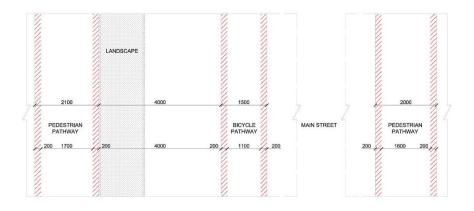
Street width and buffer spaces (in mm) for Gateway 10 in the area surrounding Luisenplatz in Darmstadt
